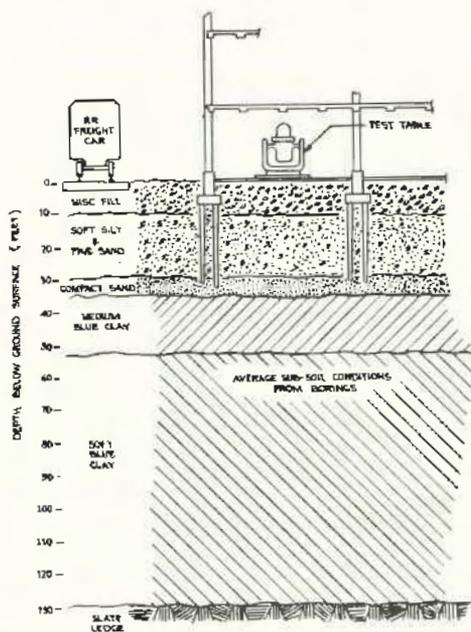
Cross-section of Soil Conditions Under Instrumentation Laboratory
